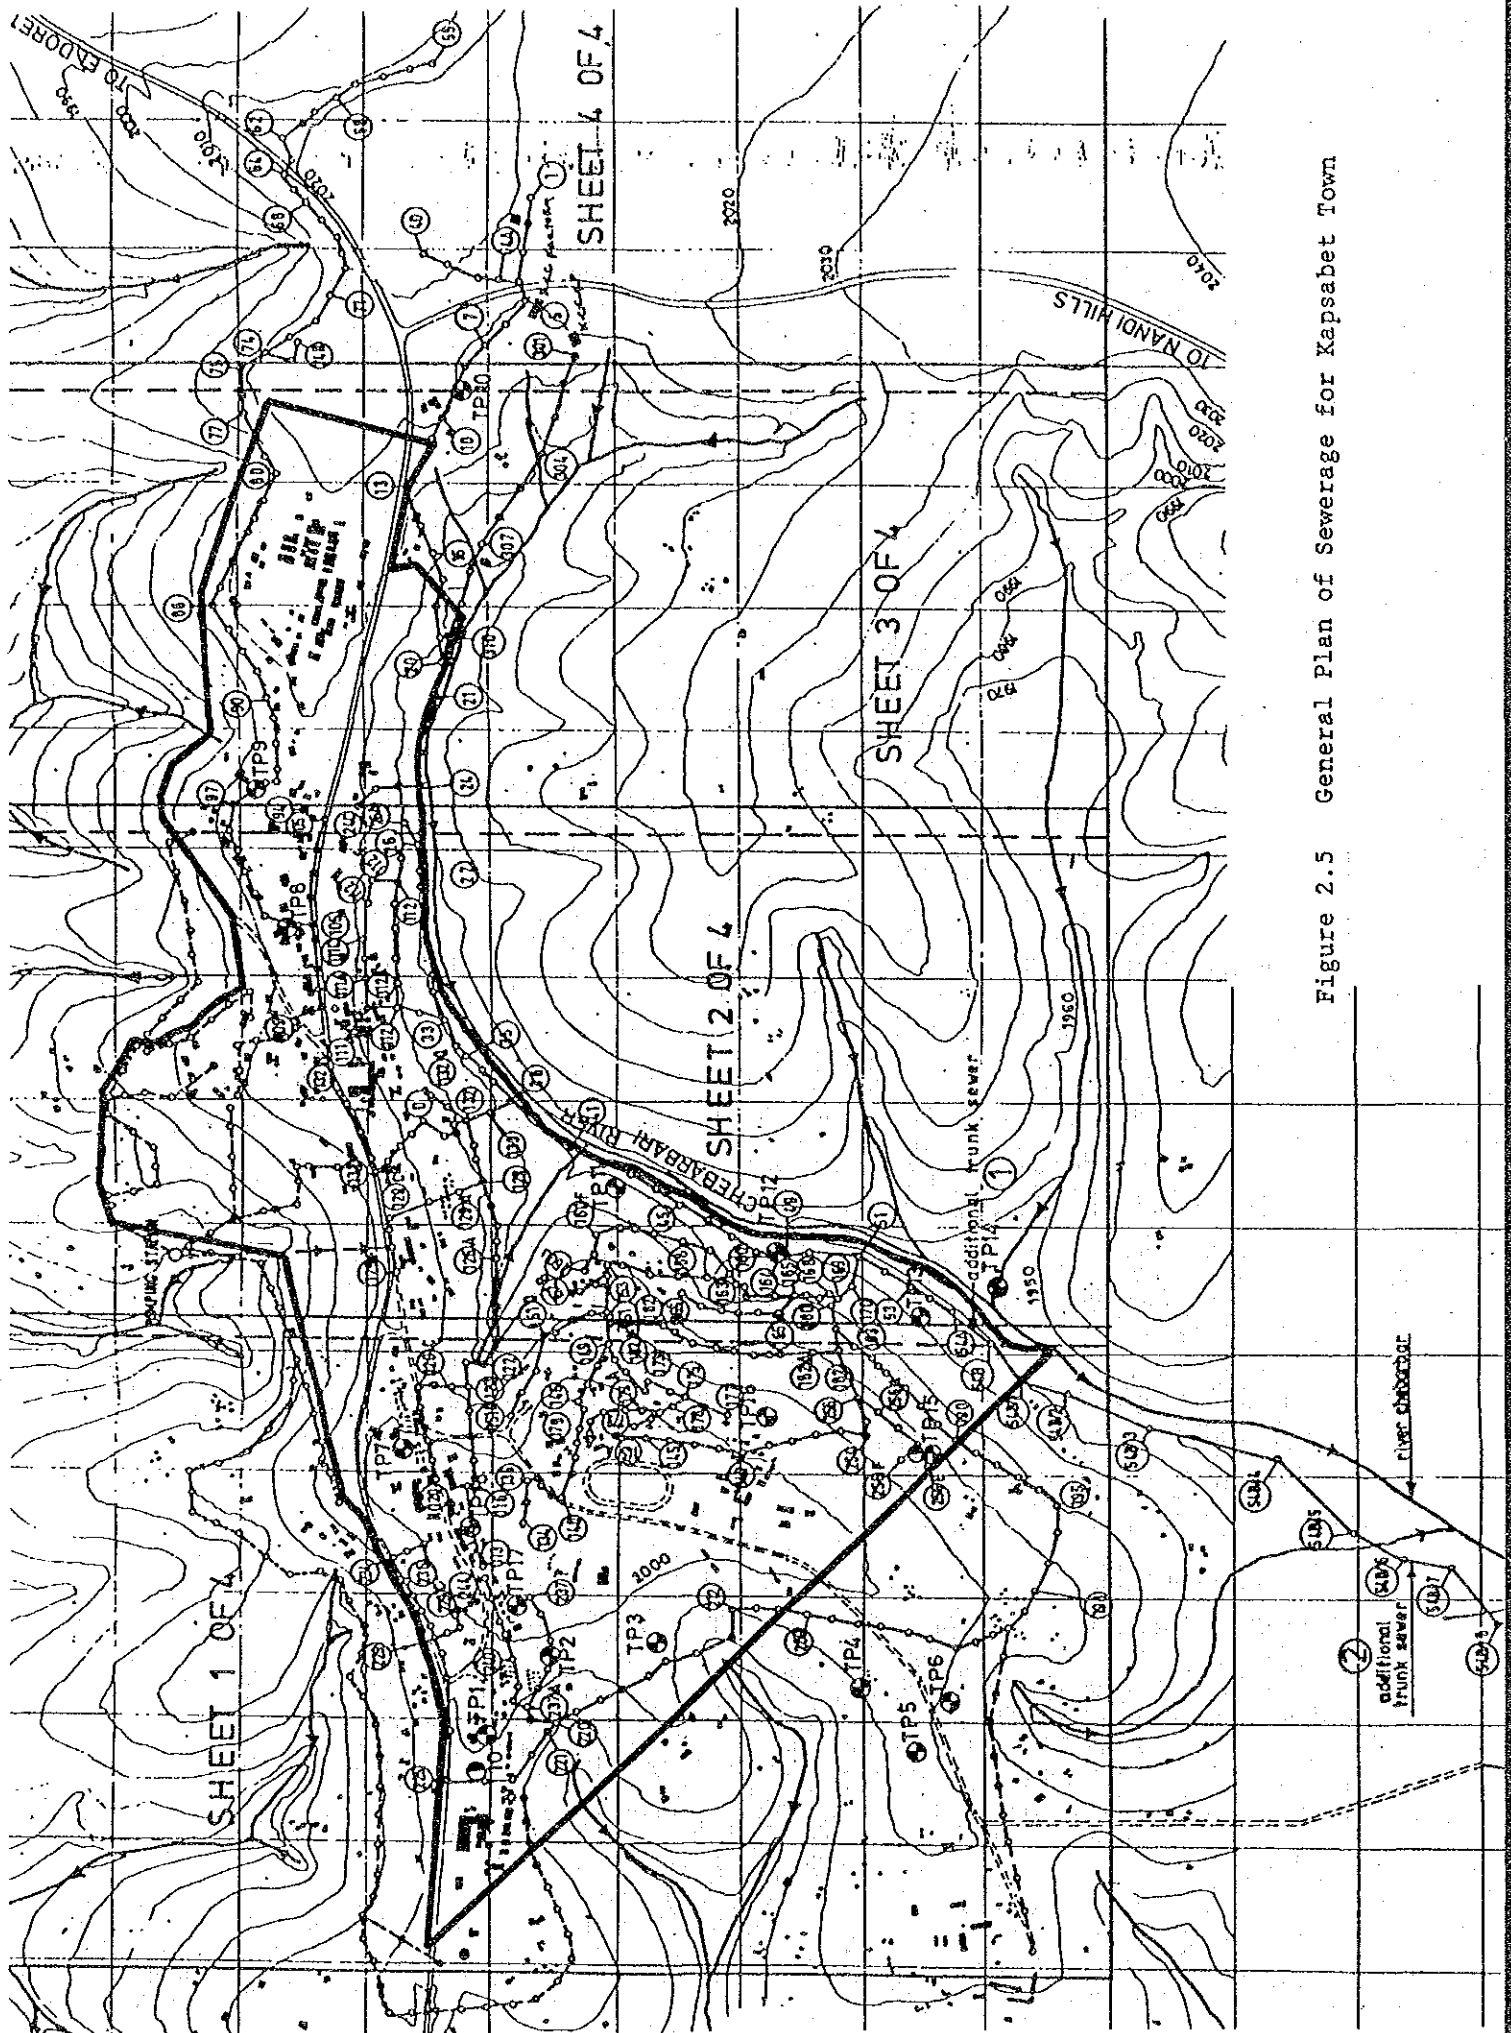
General Plan of Sewerage for Kapsabet Town
